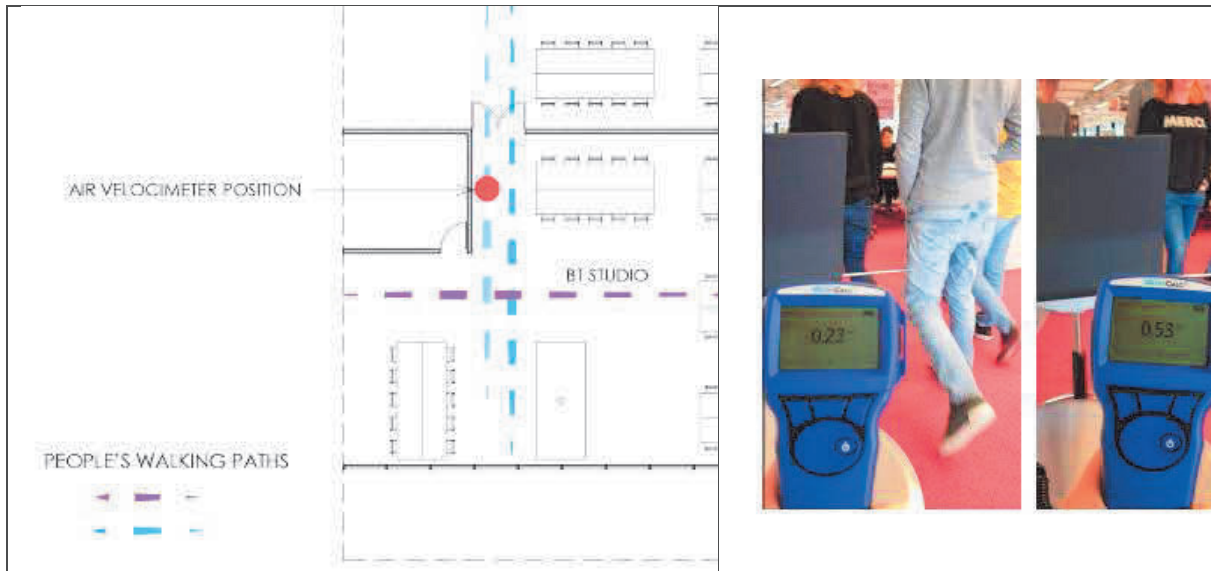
Building Technology Studie Floor plan, left, and group of four people walking from and towards the air velocity meter right [AR0125, 2019]
